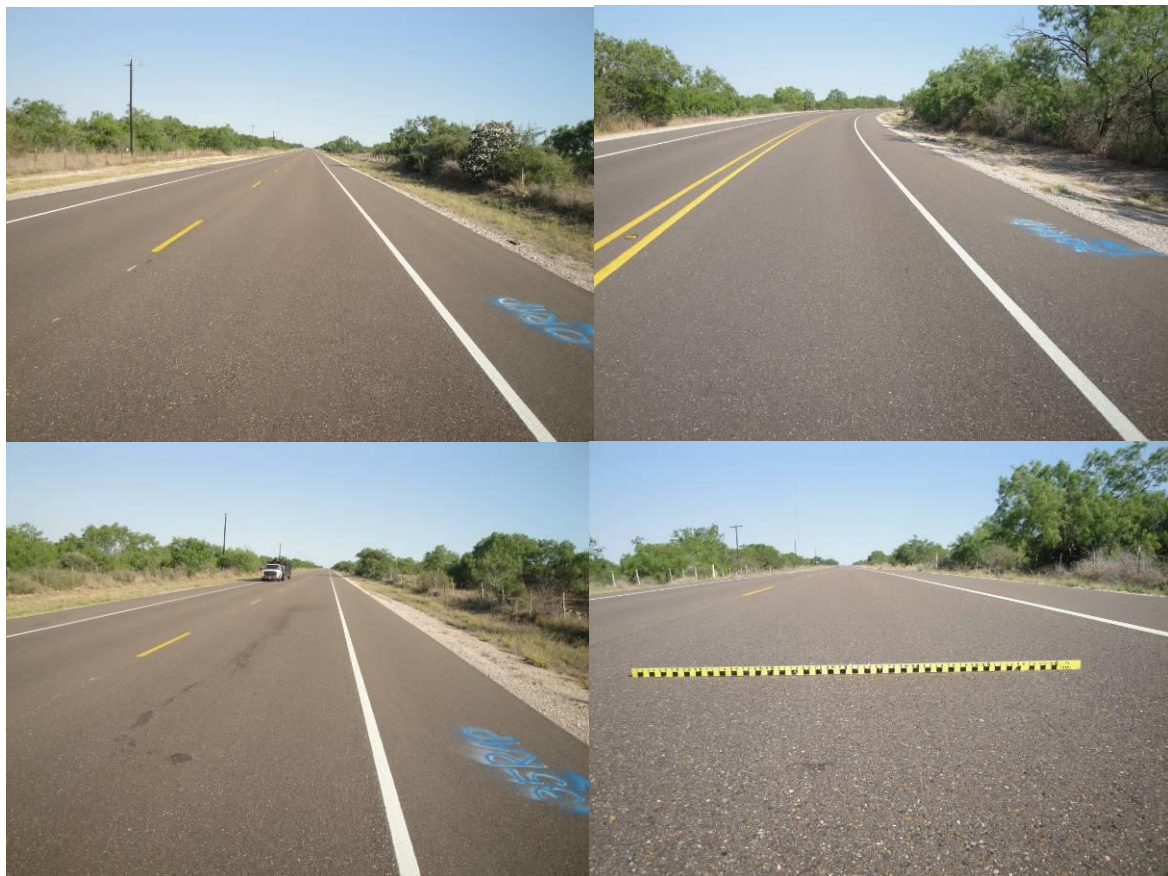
RAP Test Sections on FM1017: None of Rutting and Cracking on April 12, 2011.
